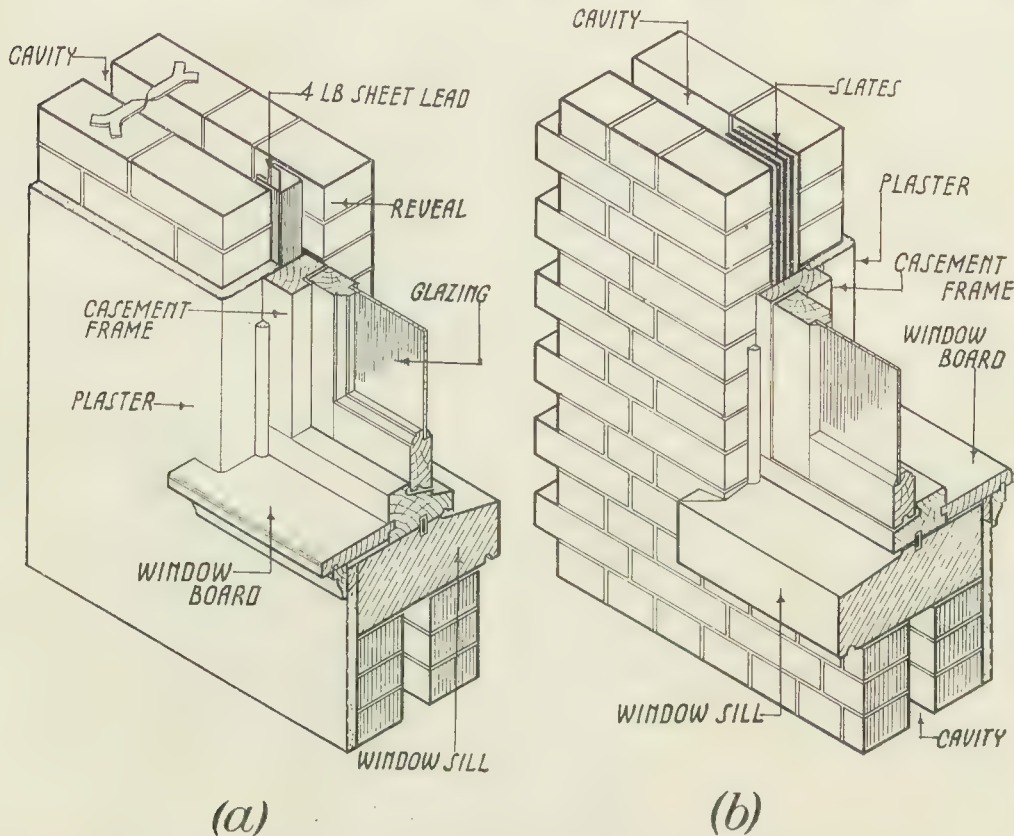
CONSTRUCTION OF BRICK CAVITY WALLS AT SIDES OF OPENINGS
